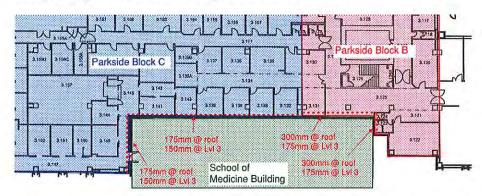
Seismic gap requirements between Parkside B&C and School of Medicine Building
